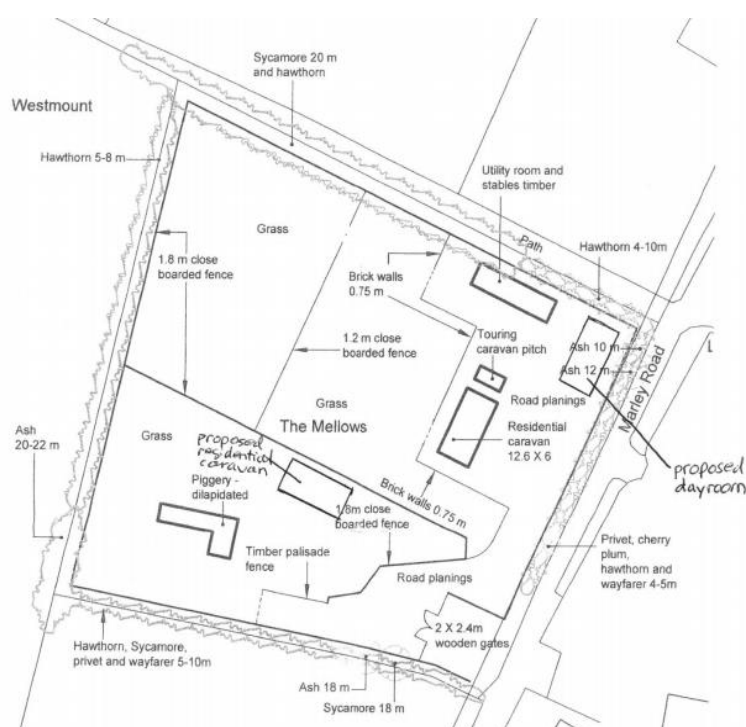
Block Plan of ref. 17/504435/FULL Erection of a day room (approved – total of two statics, two dayrooms, utility room/stables and a touring caravan)
